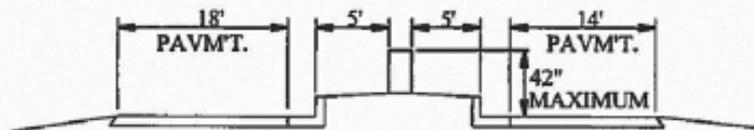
DETAIL SECTION VIEW OF INTERIOR ISLAND AND MARKER
